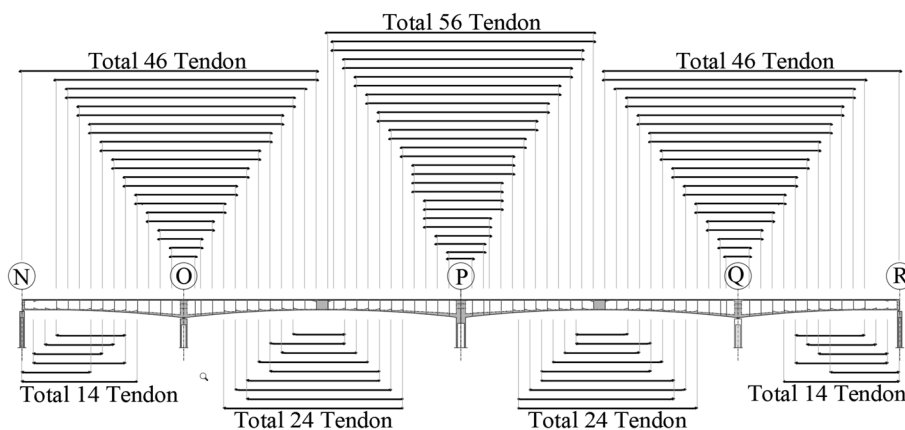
Longitudinal prestressing layout of El-Warrak Bridge (“cantilever” and “continuity” tendons)
